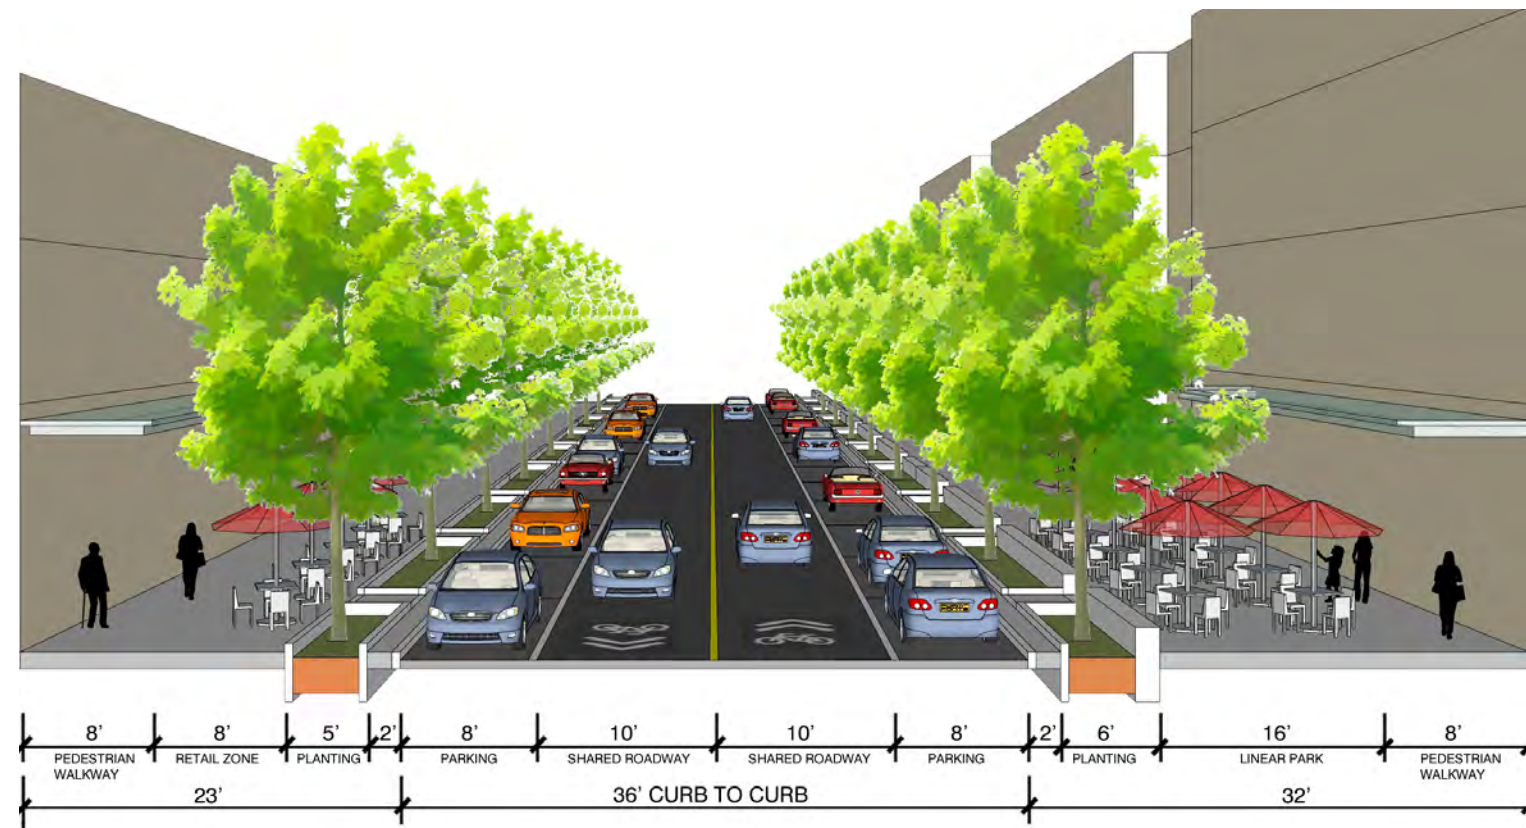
The Loop Retail Street Section (Linear Park Along Retail)
